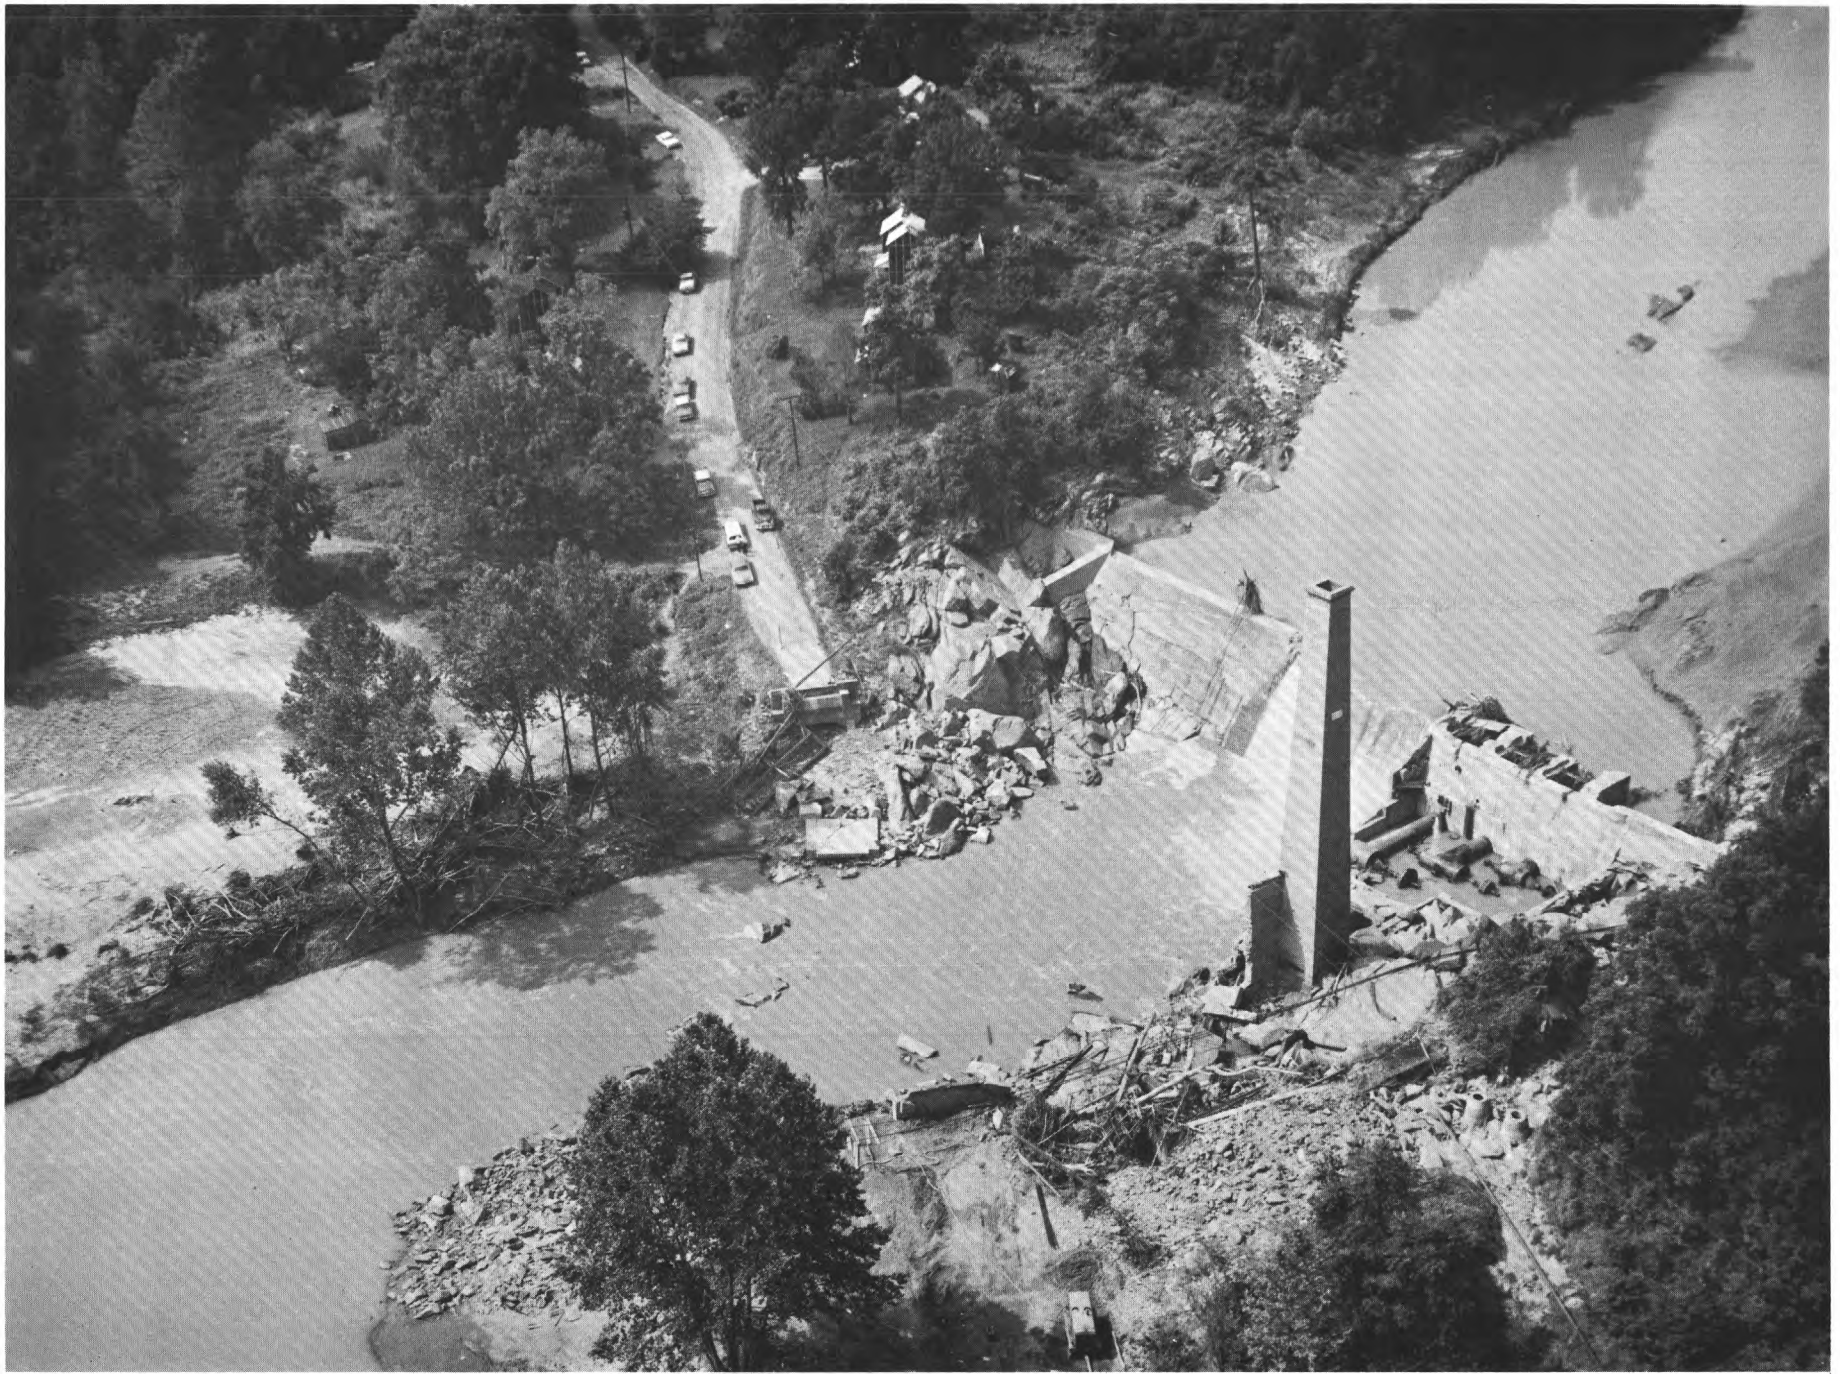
Flood damage to bridge and dam, Rockfish River at Schuyler.
